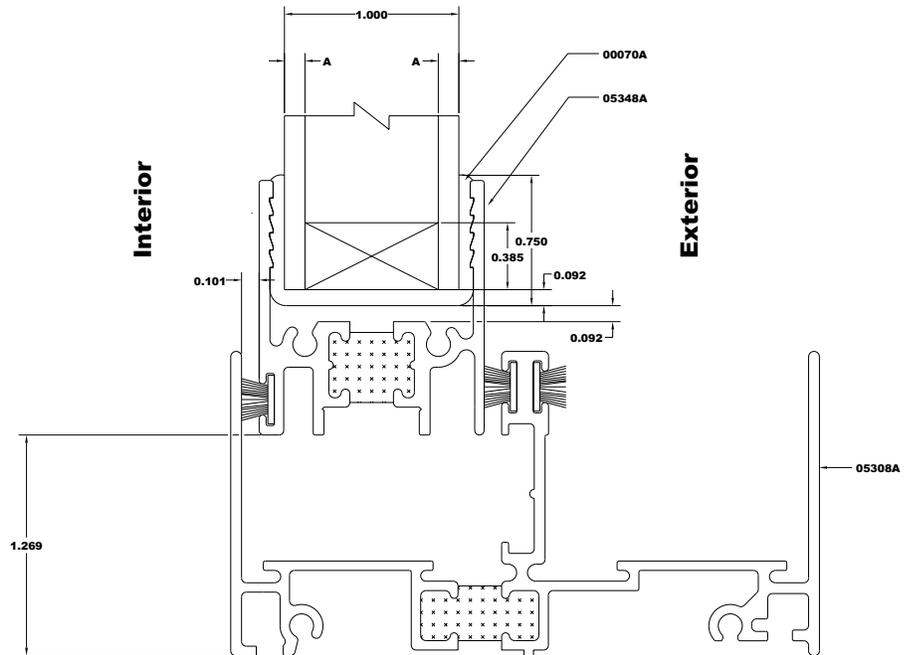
Vent Head Drawing for Horizontal Aluminum Slider.
